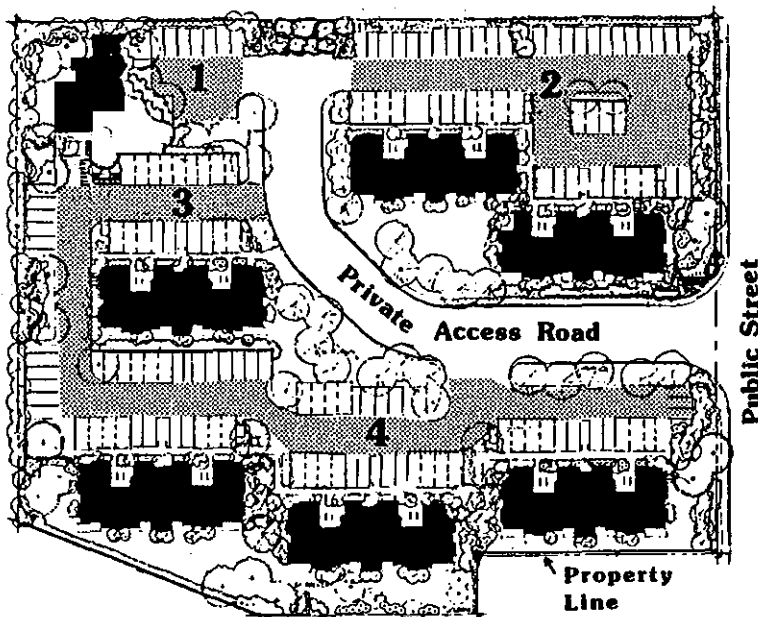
A site plan with four parking areas, an access road and parking circulation aisle.
